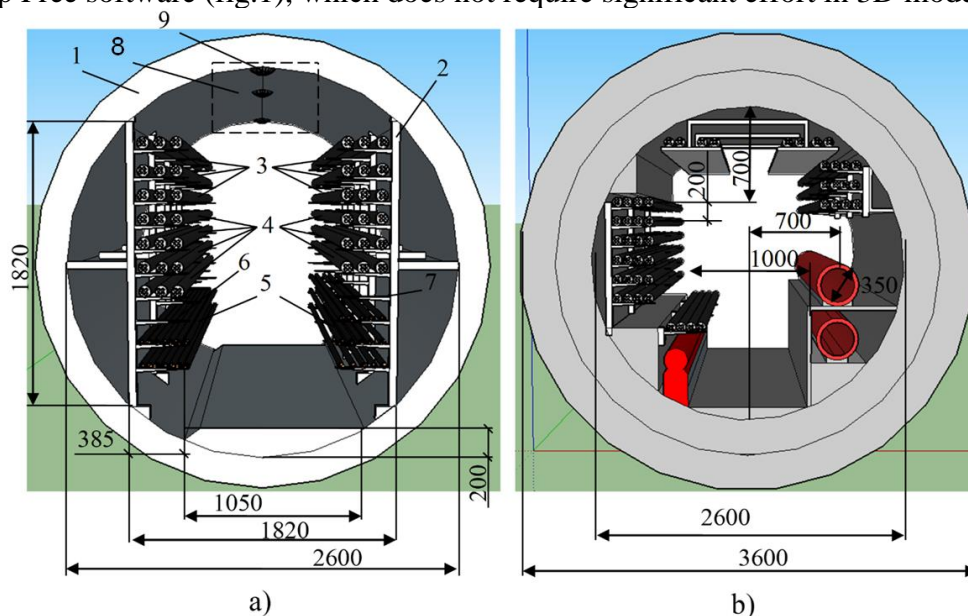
Placement of cables in tunnels and round cross-section collectors:
